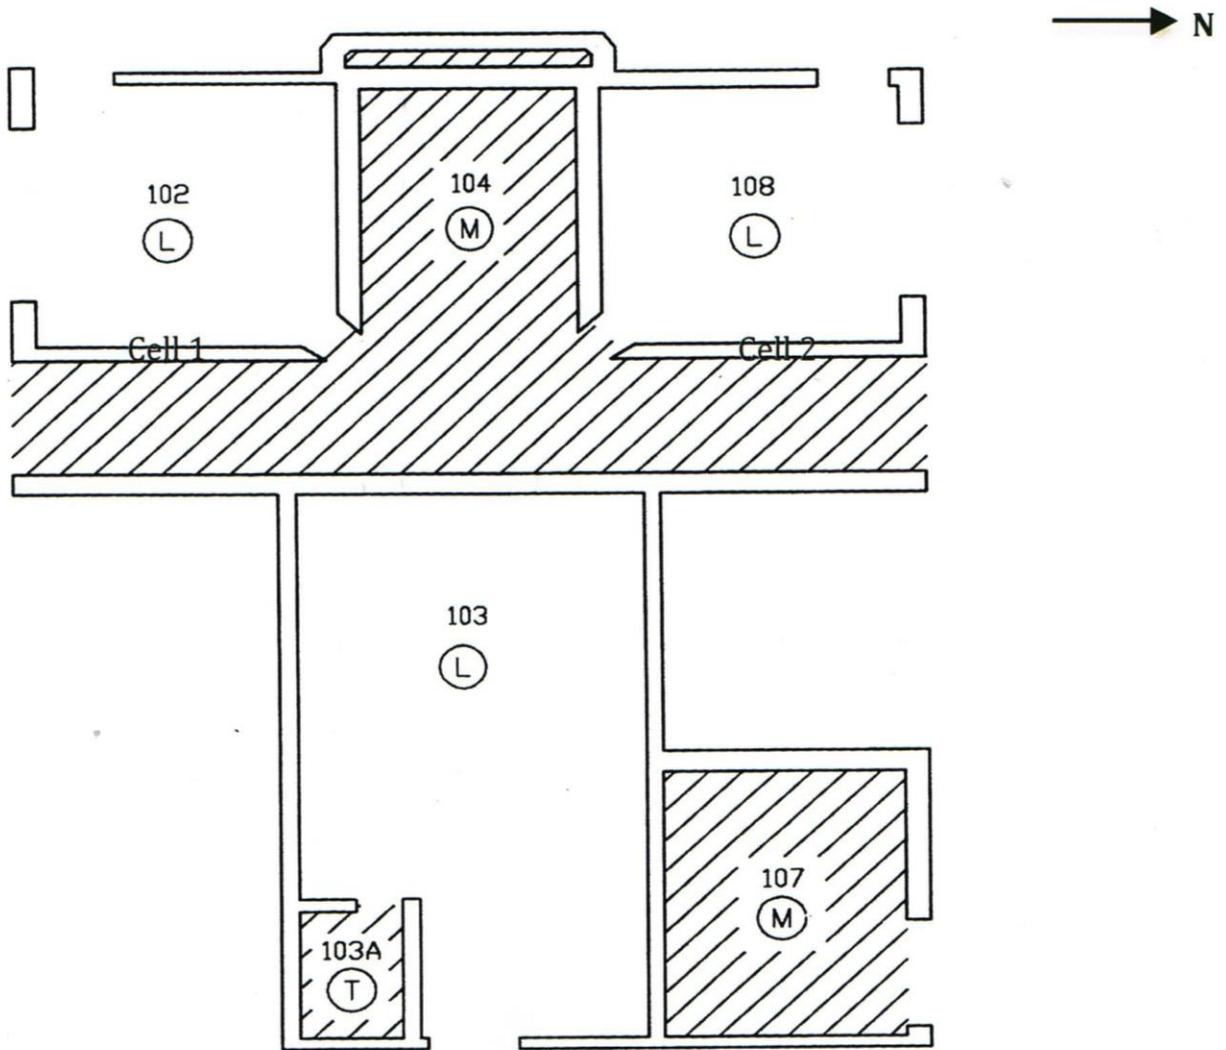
Lab Building 825, Facility Keyplan, 1996. LLNL Archives, (PKS96-825-001B)
